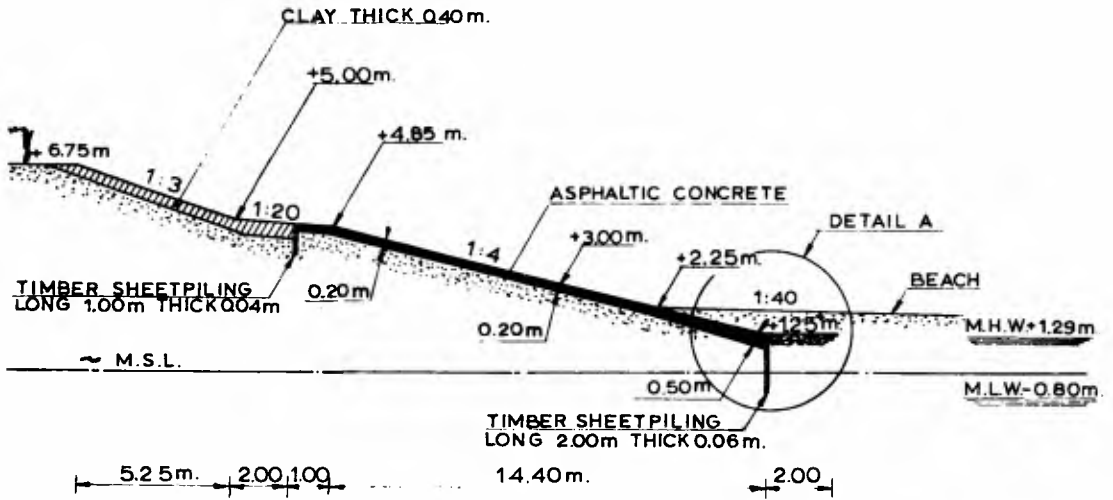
ASPHALT CONCRETE REVETMENT BUILT IN DELTA AREA
